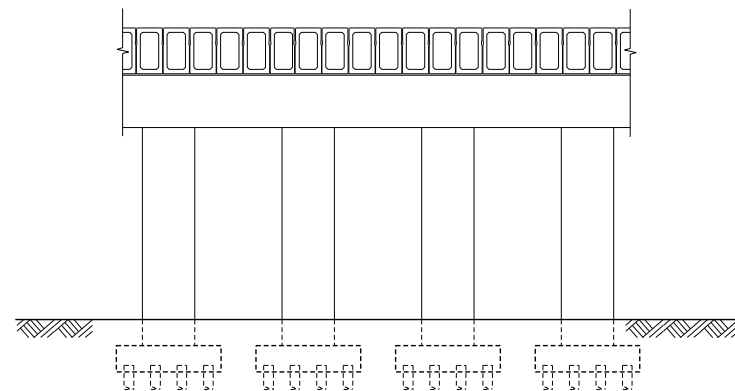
Typical Section for PC/PS Box Girder Structure
